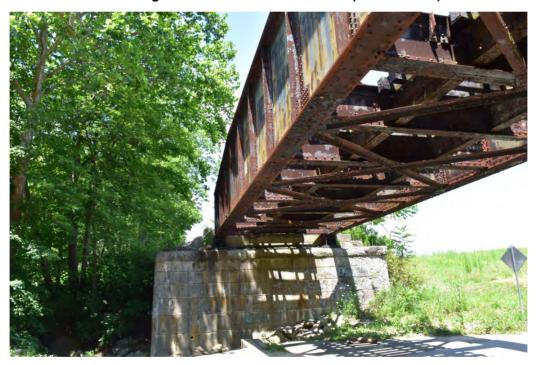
Railroad Bridge over Thrifton Road (7130244), facing north.
